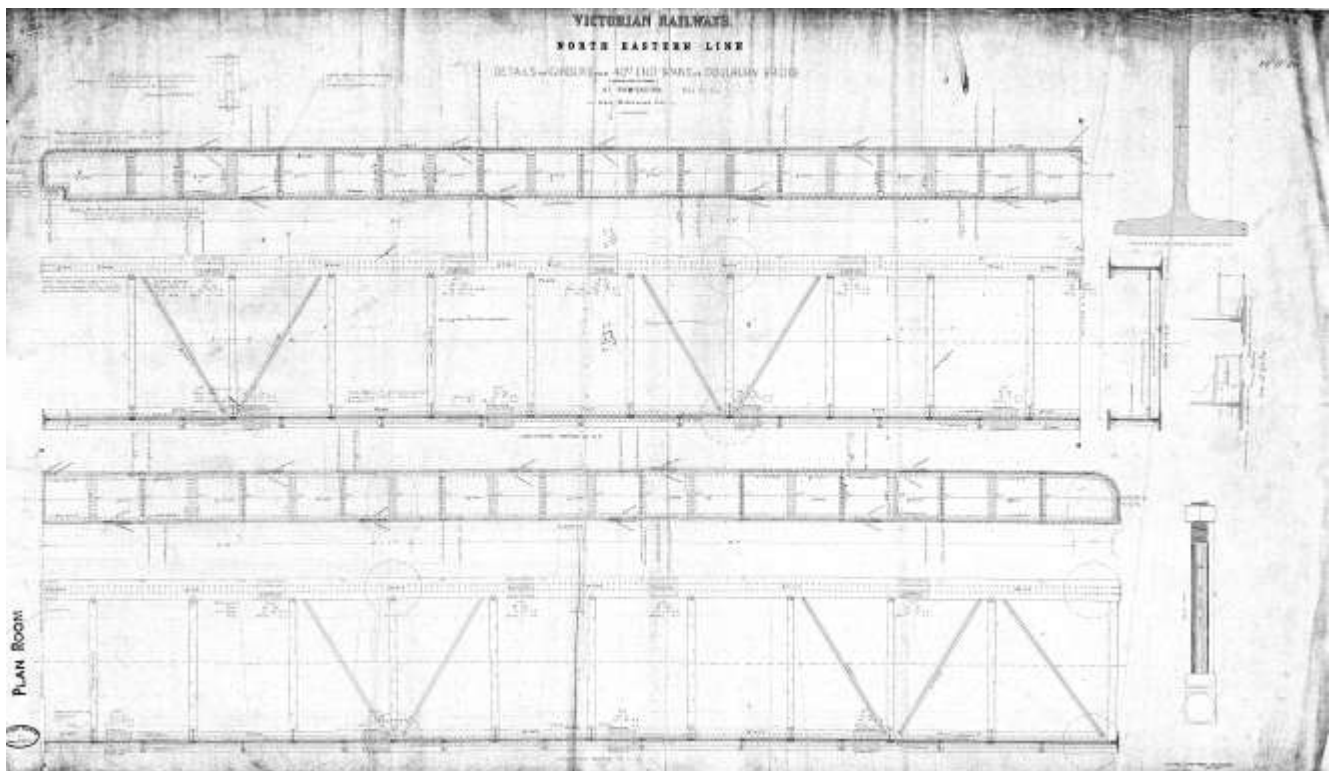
Details of girders and general arrangement Drawing 49 Victorian Railways 1871 Source: VicTrack Drawings
